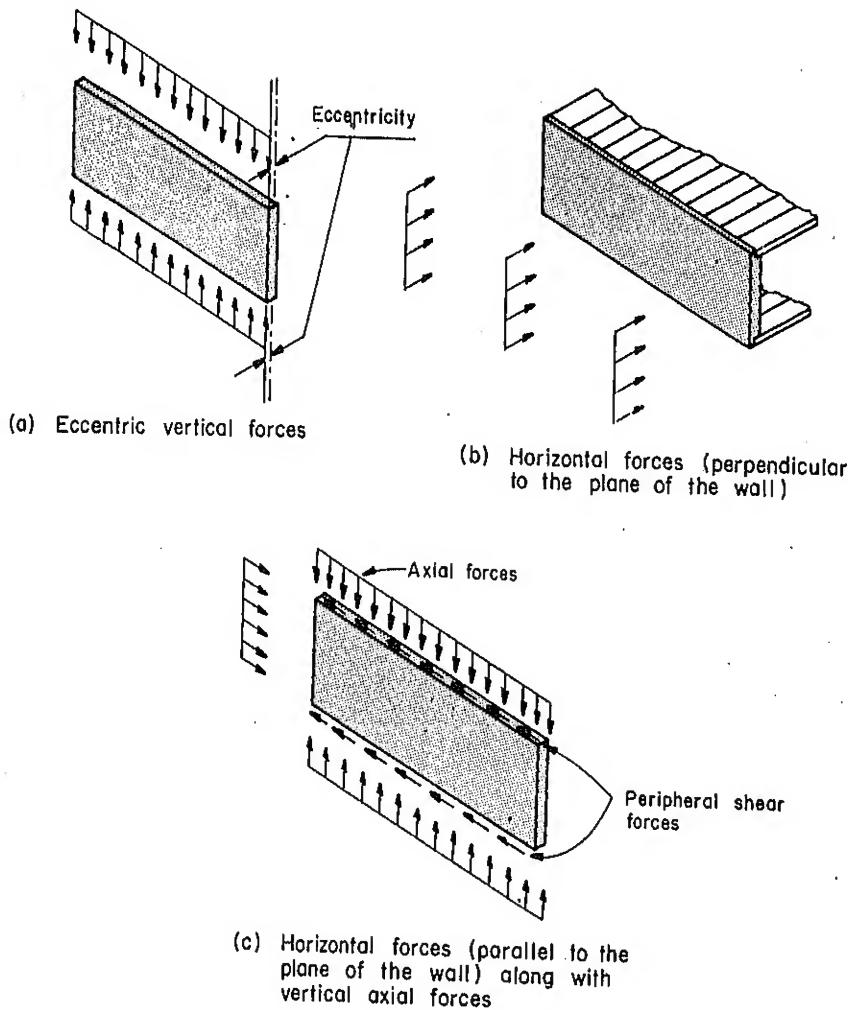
Vertical and Horizontal Forces on Wall Panels
